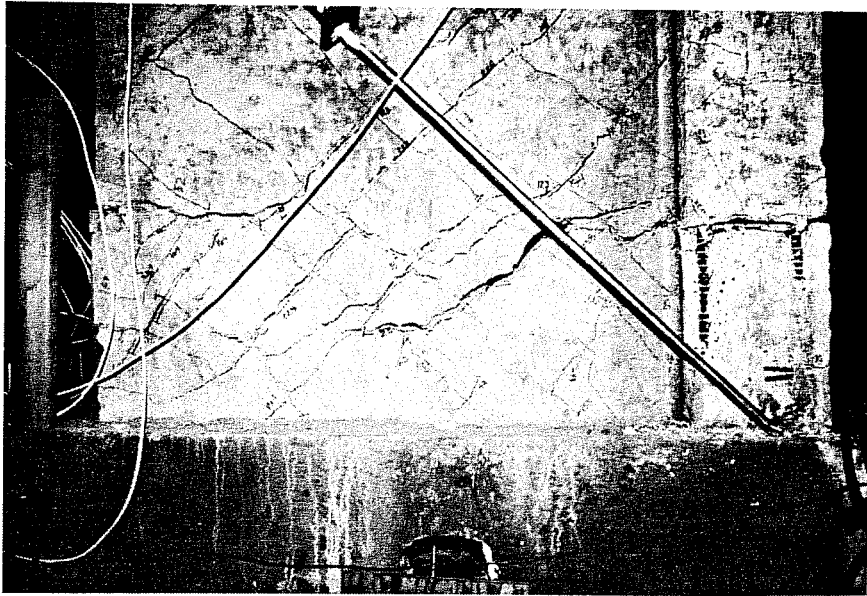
Upload Pier Under Load at Failure
